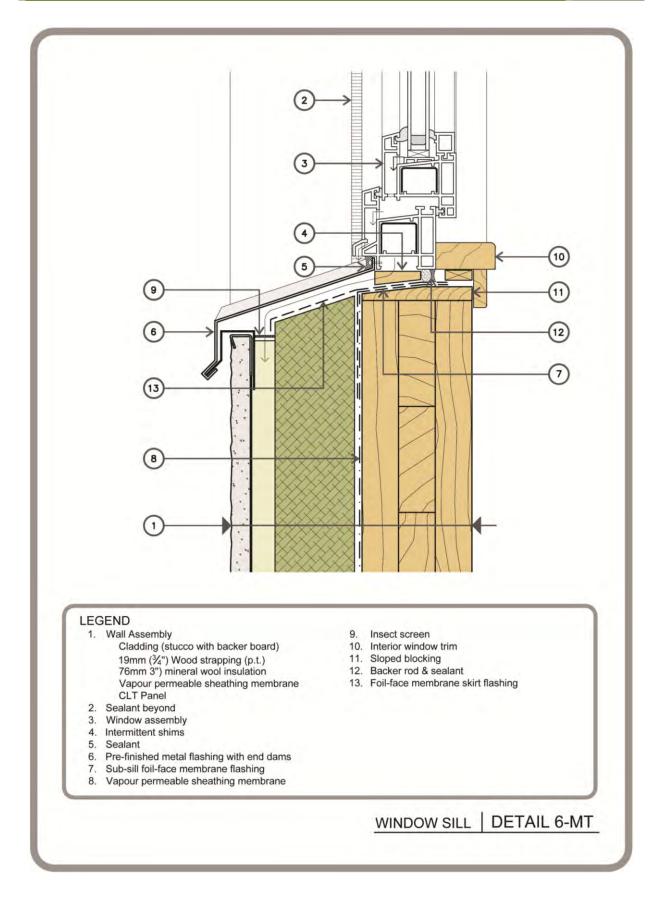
Detail 6-MT – Location of Critical Barriers
